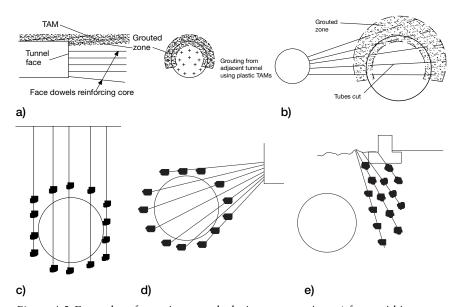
Examples of grouting tunnels during construction, a) from within a tunnel, b) using an adjacent tunnel (after Woodward 2005), c) from the ground surface, d) from an adjacent shaft, or e) as protection to adjacent structures (after Baker 1982, used with permission from ASCE)
